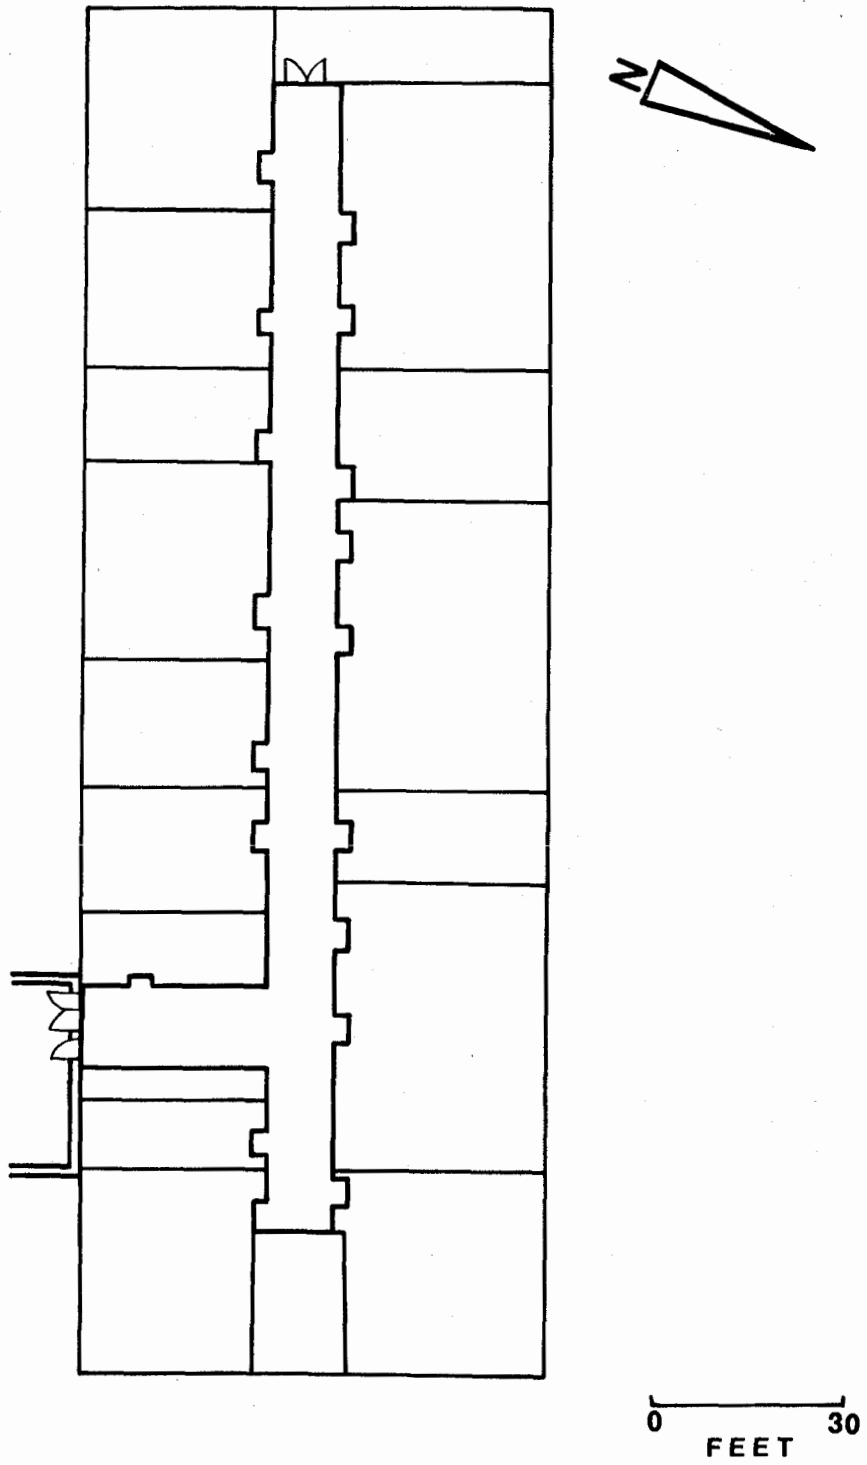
Scarfe Building, Classroom Block, Second Floor.
